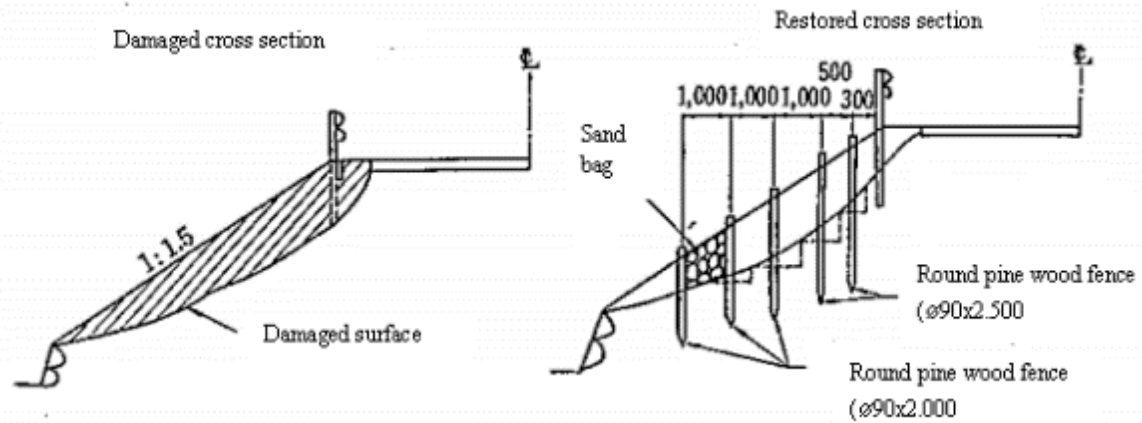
Examples of damaged steep slope due to standing water restriction method
